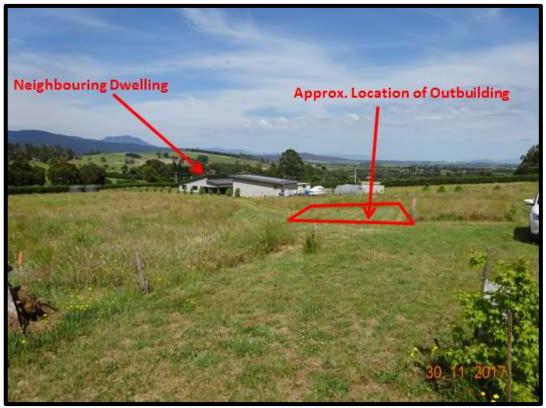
subject site, looking south-west, showing the approximate location of the proposed outbuilding and a neighbouring dwelling to the west
